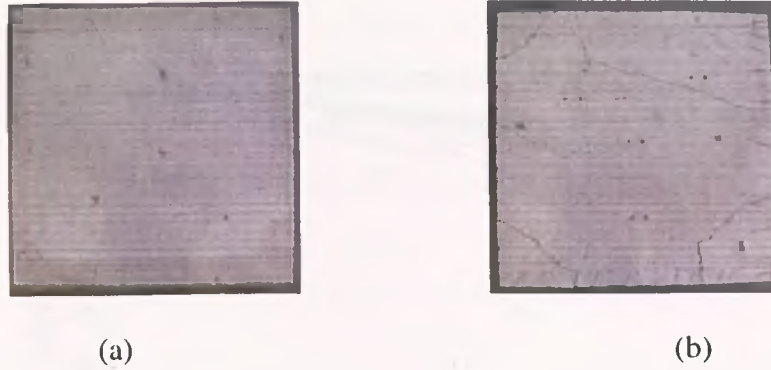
Test 8 (a) View of bottom surface of slab and (b) View of top surface of slab.
